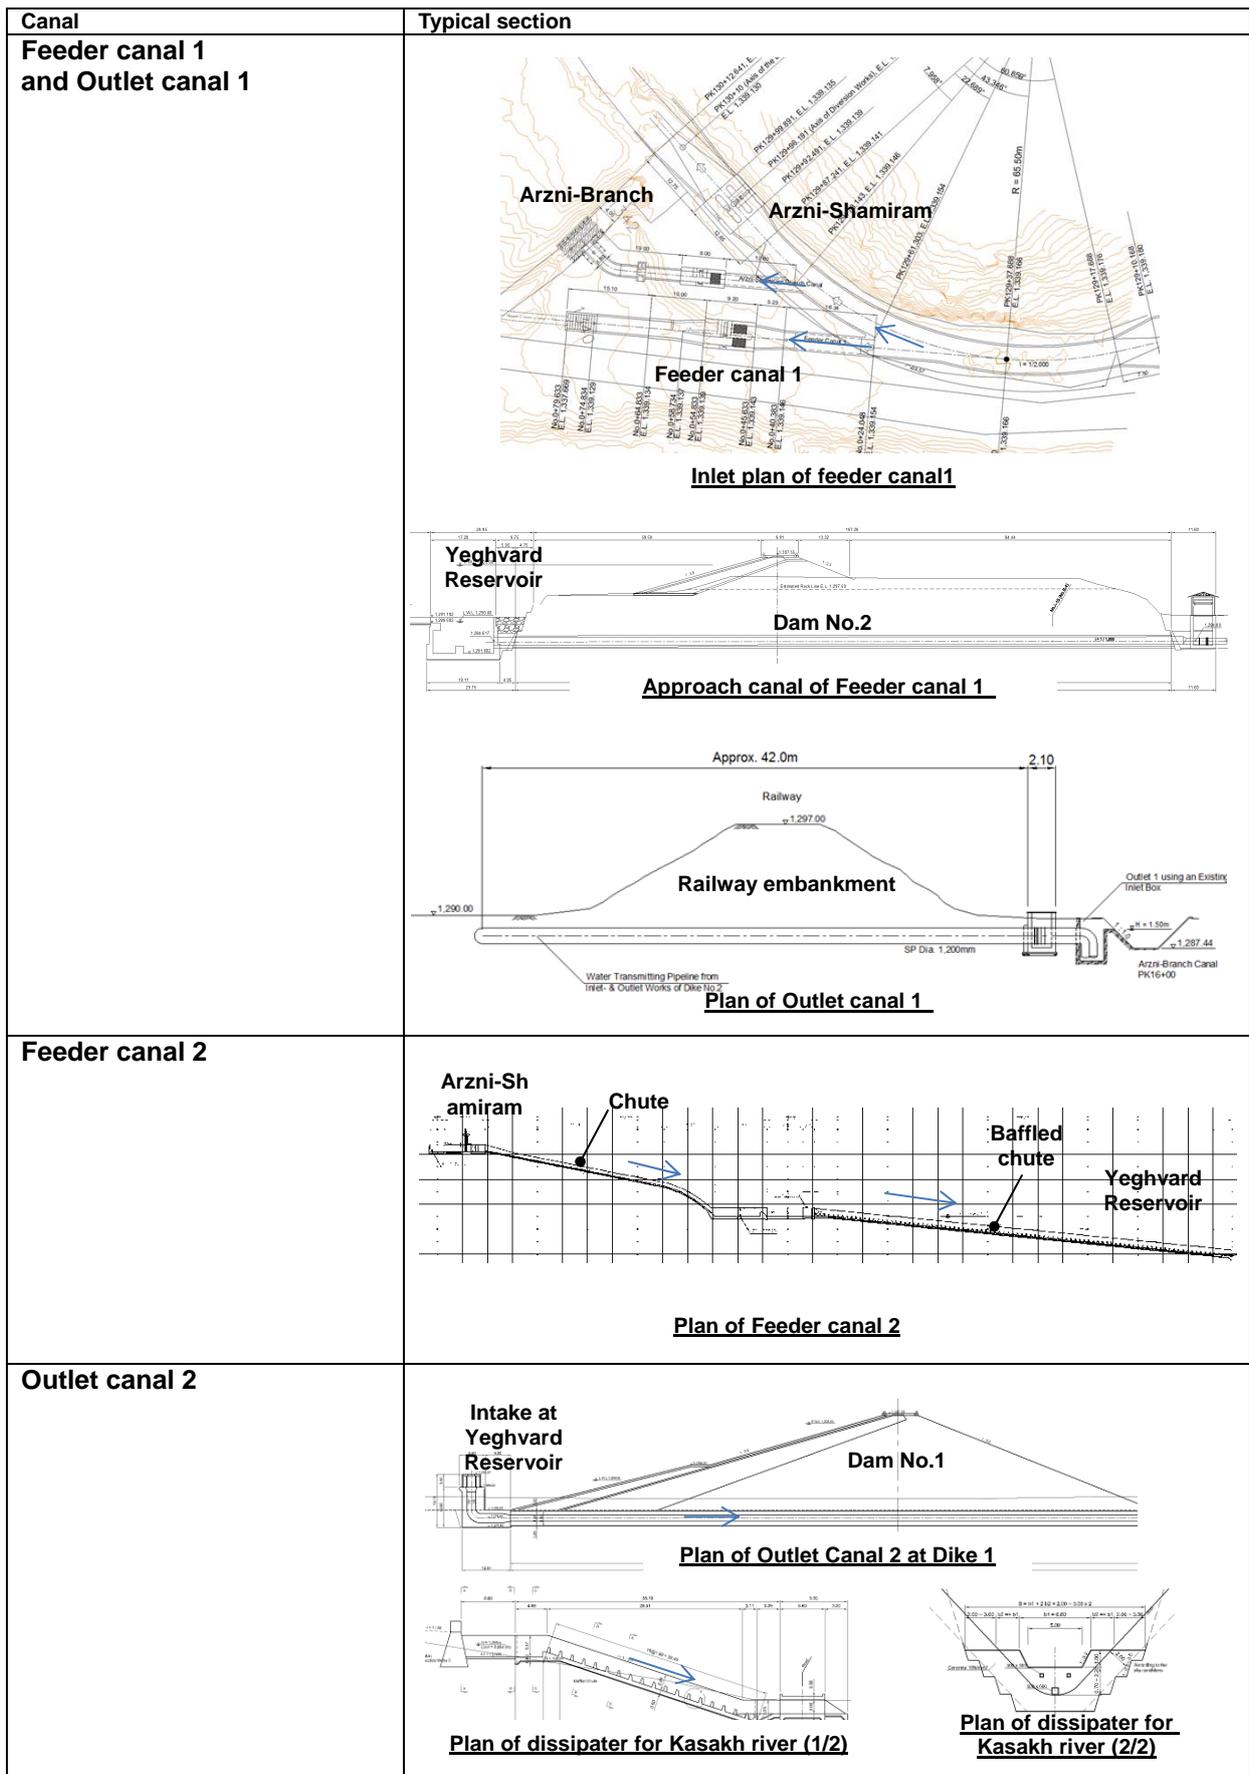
Typical Section of Planned Feeder and Outlet Canal
